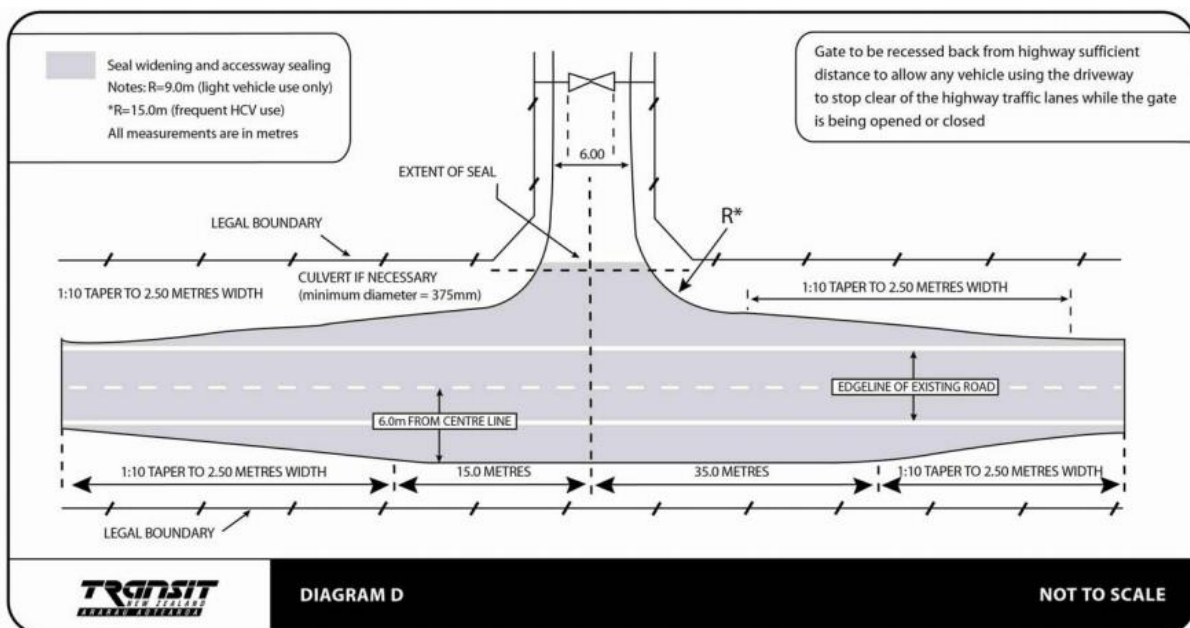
RECOMMENDED SEAL WIDENING AT ENTRANCE
